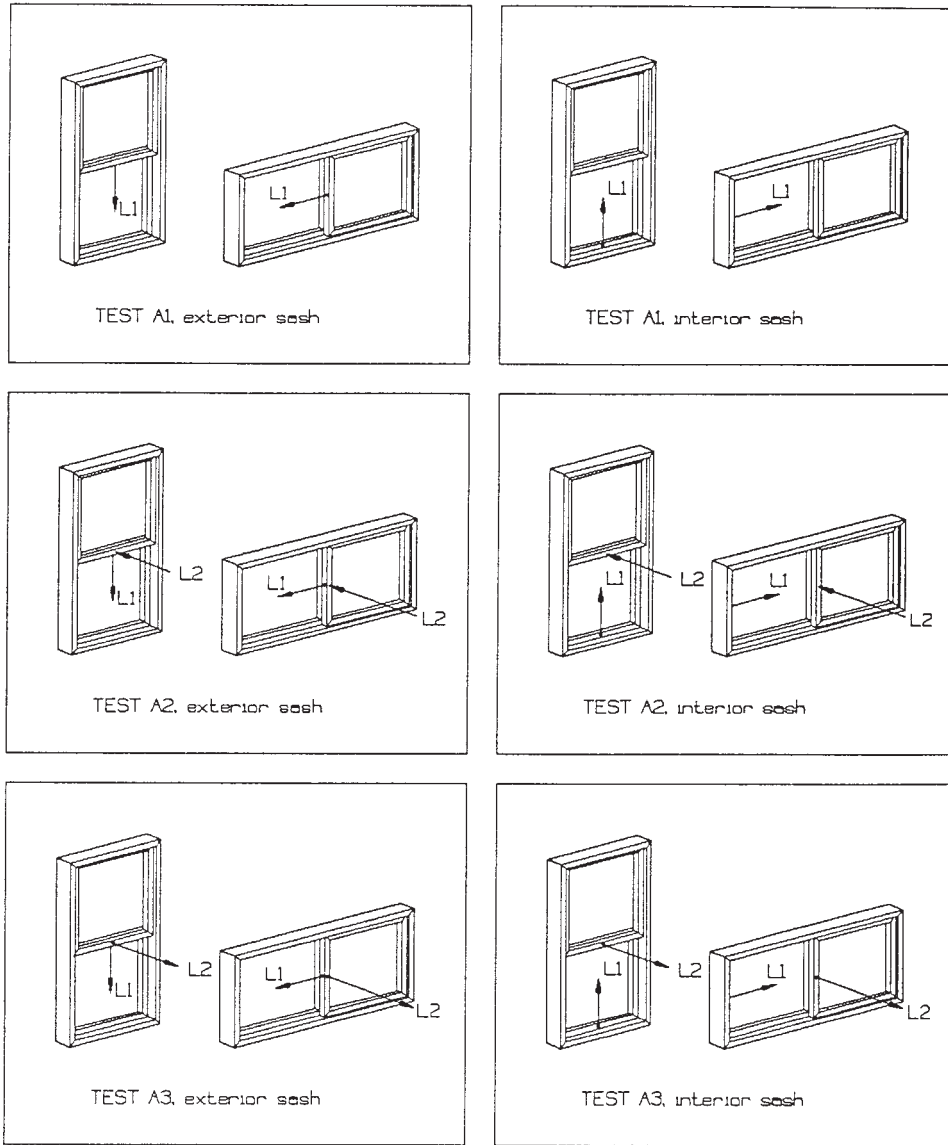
Schematic of Test Load Applications (viewed from the exterior)
